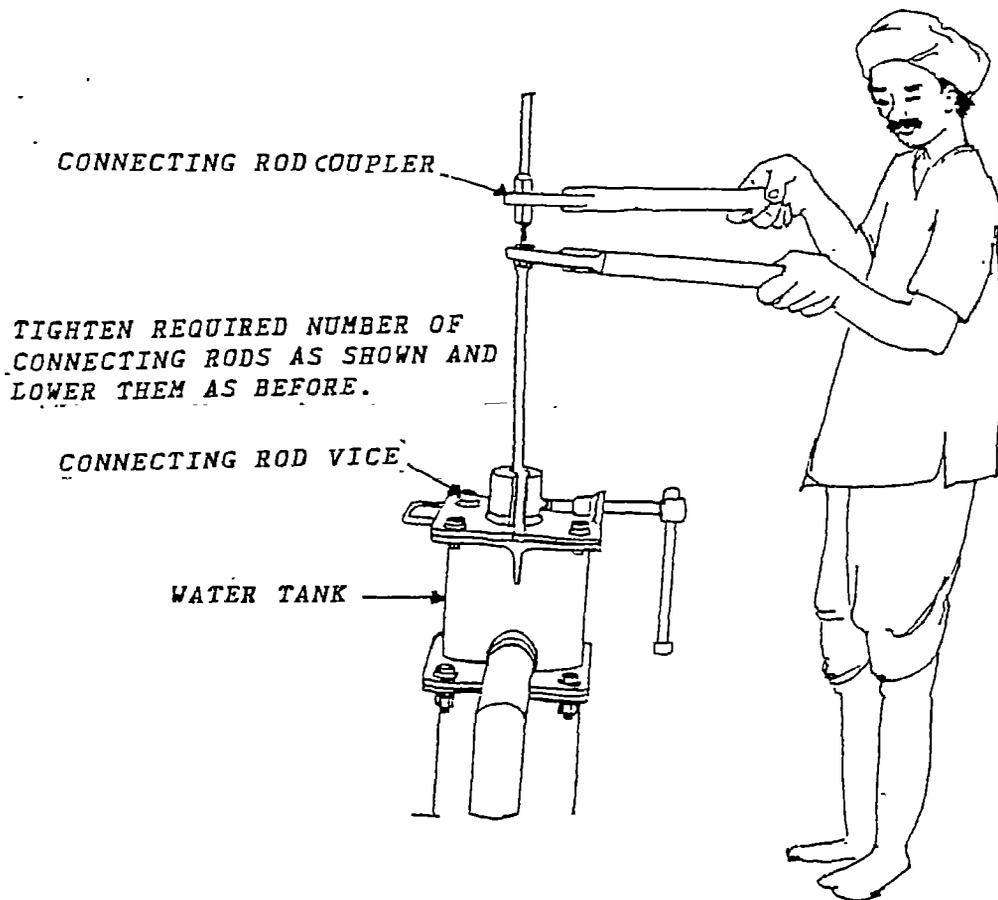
JOIN THE CONNECTING ROD AS PER REQUIREMENT.
